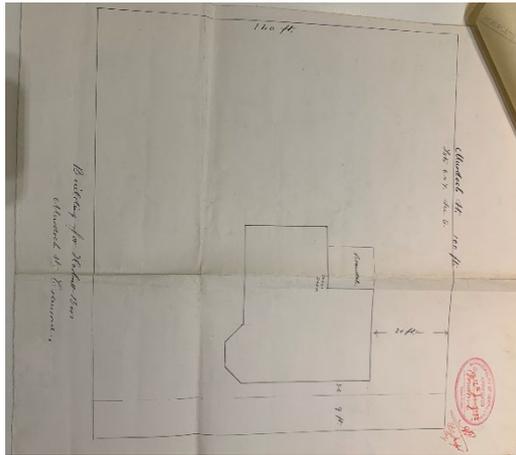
Block plan accompanying application BA 12/234 for the construction of a two-storey building on Lots 6 and 7 Murdoch Street.
